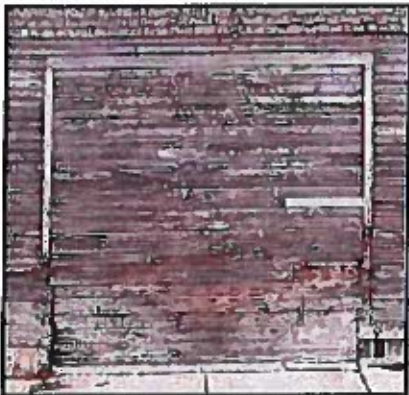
The original west facade door opening has been filled in with clapboards, but the original door remains inside as shown in photo 42 on the right. If the opening is to remain filled in the frame casings should be retained or duplicated to express where the door was. It would be better to have the door exposed.
